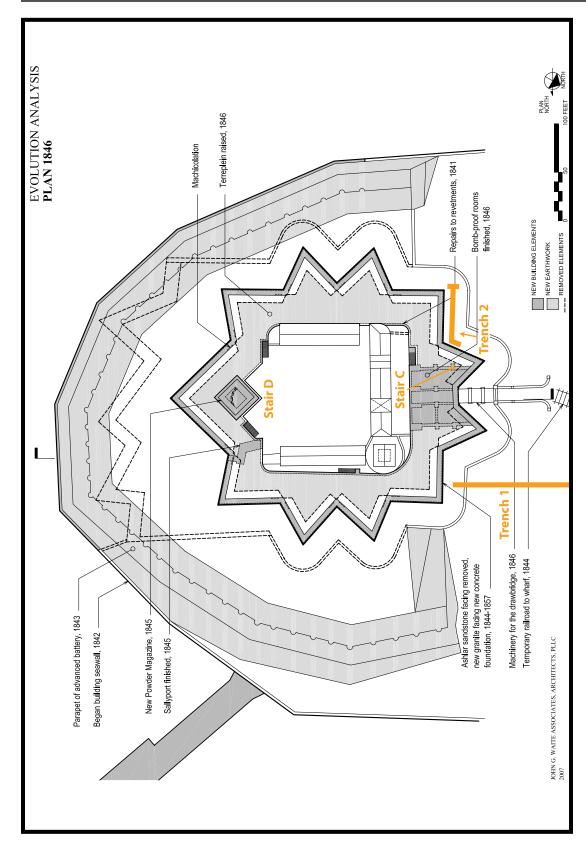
Plan of Fort Wood. 1846. Locations of Stairs C and D and Trenches 1 and 2 as indicated. Source: John G. Waite Associates n.d.
